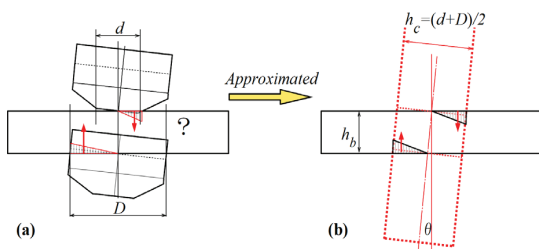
An approximated mechanical model for the bracket arm contacting with two large bearing blocks.
